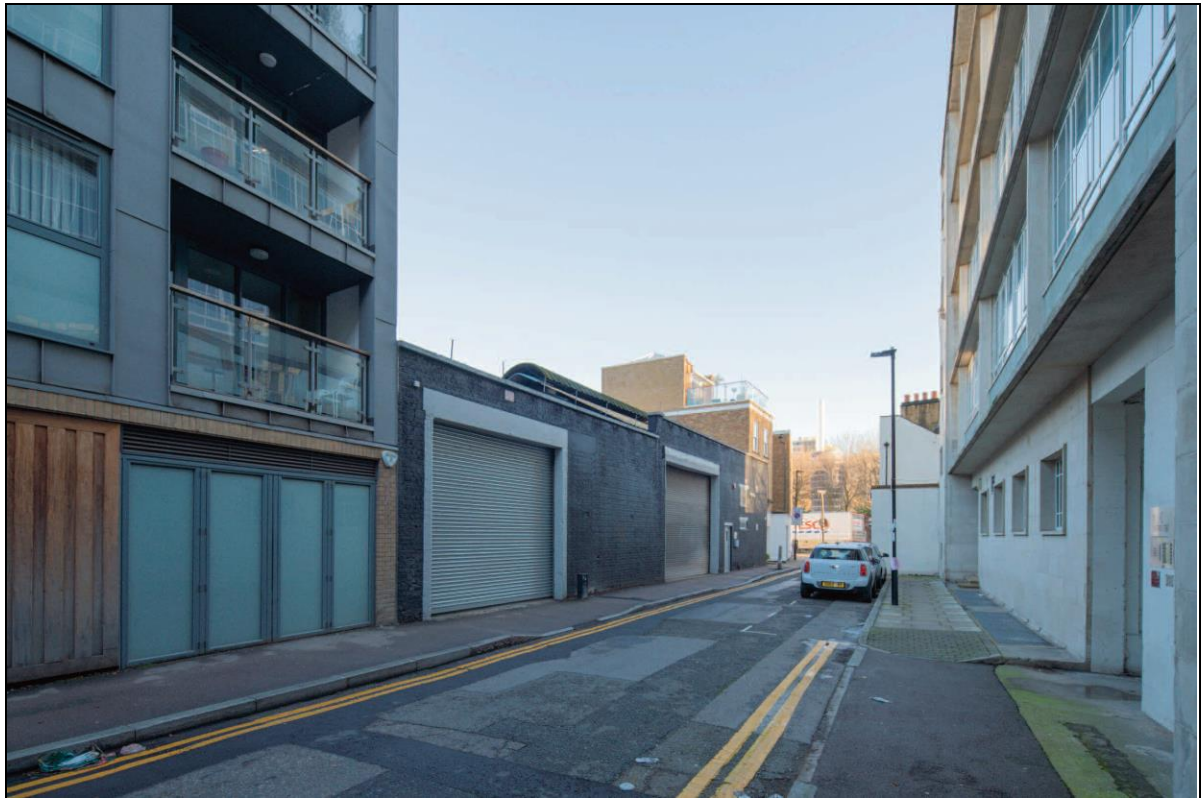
The existing front elevation looking north-east along Bastwick Street towards the junction with Central Street
